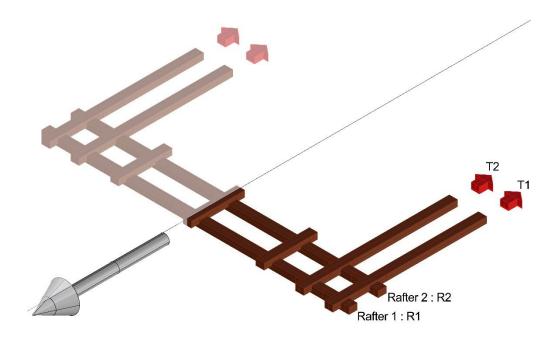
Descriptions of the rafters crossed at the roof timber beam actions (normal rafter)
